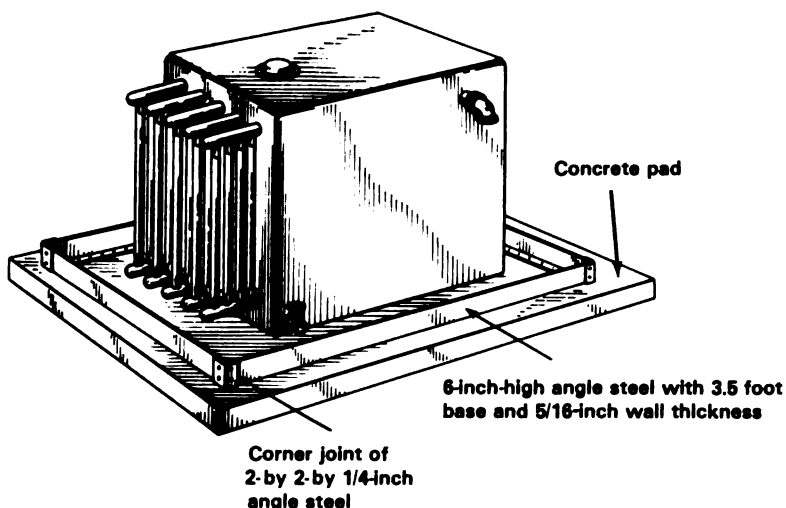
Typical transformer and switch gear on concrete mounting pad with steel dike installed.
